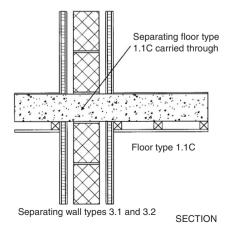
Floor type 1.1C - wall types 3.1 and 3.2
